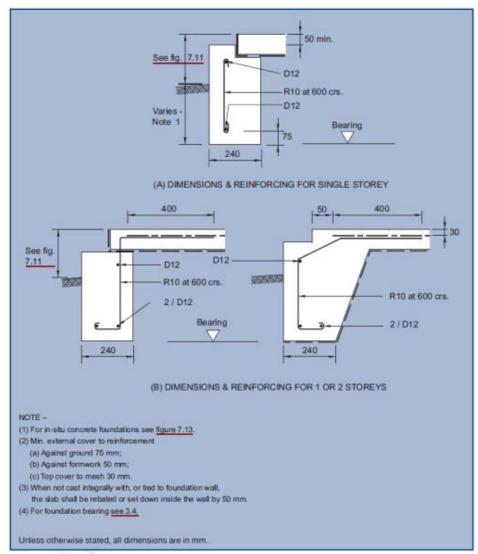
Masonry veneer foundation edge details – in-situ concrete
